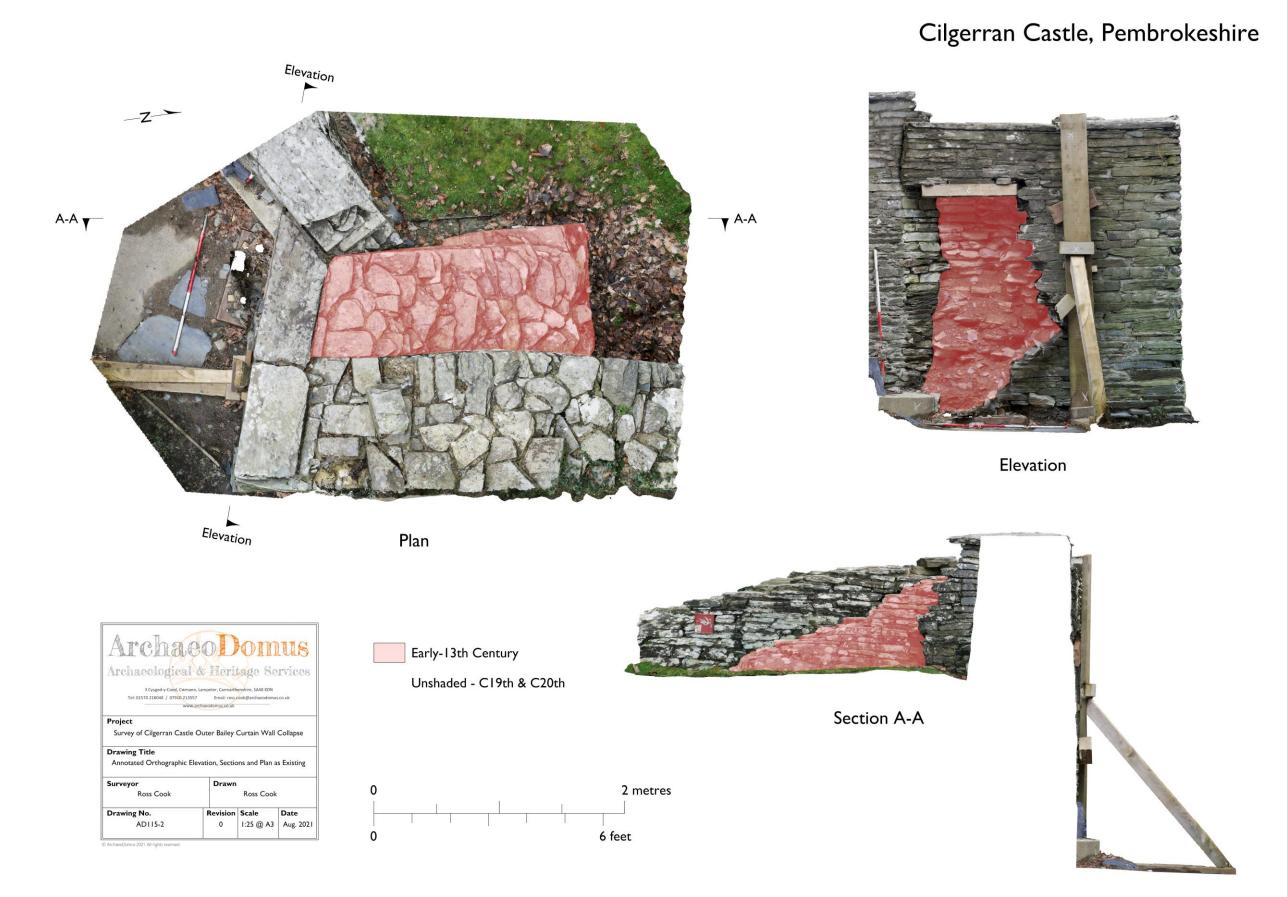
Orthographic Elevation, Section and Plan as Existing.
